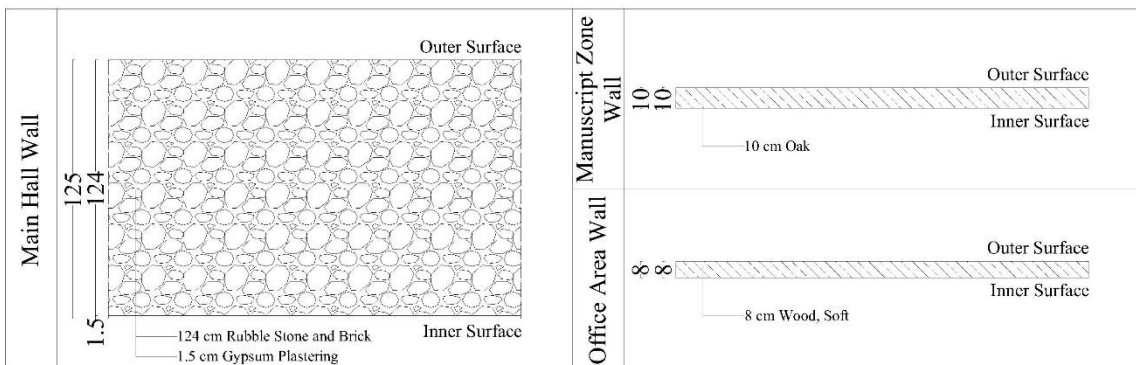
Sections of main hall, manuscript zone and office area wall
